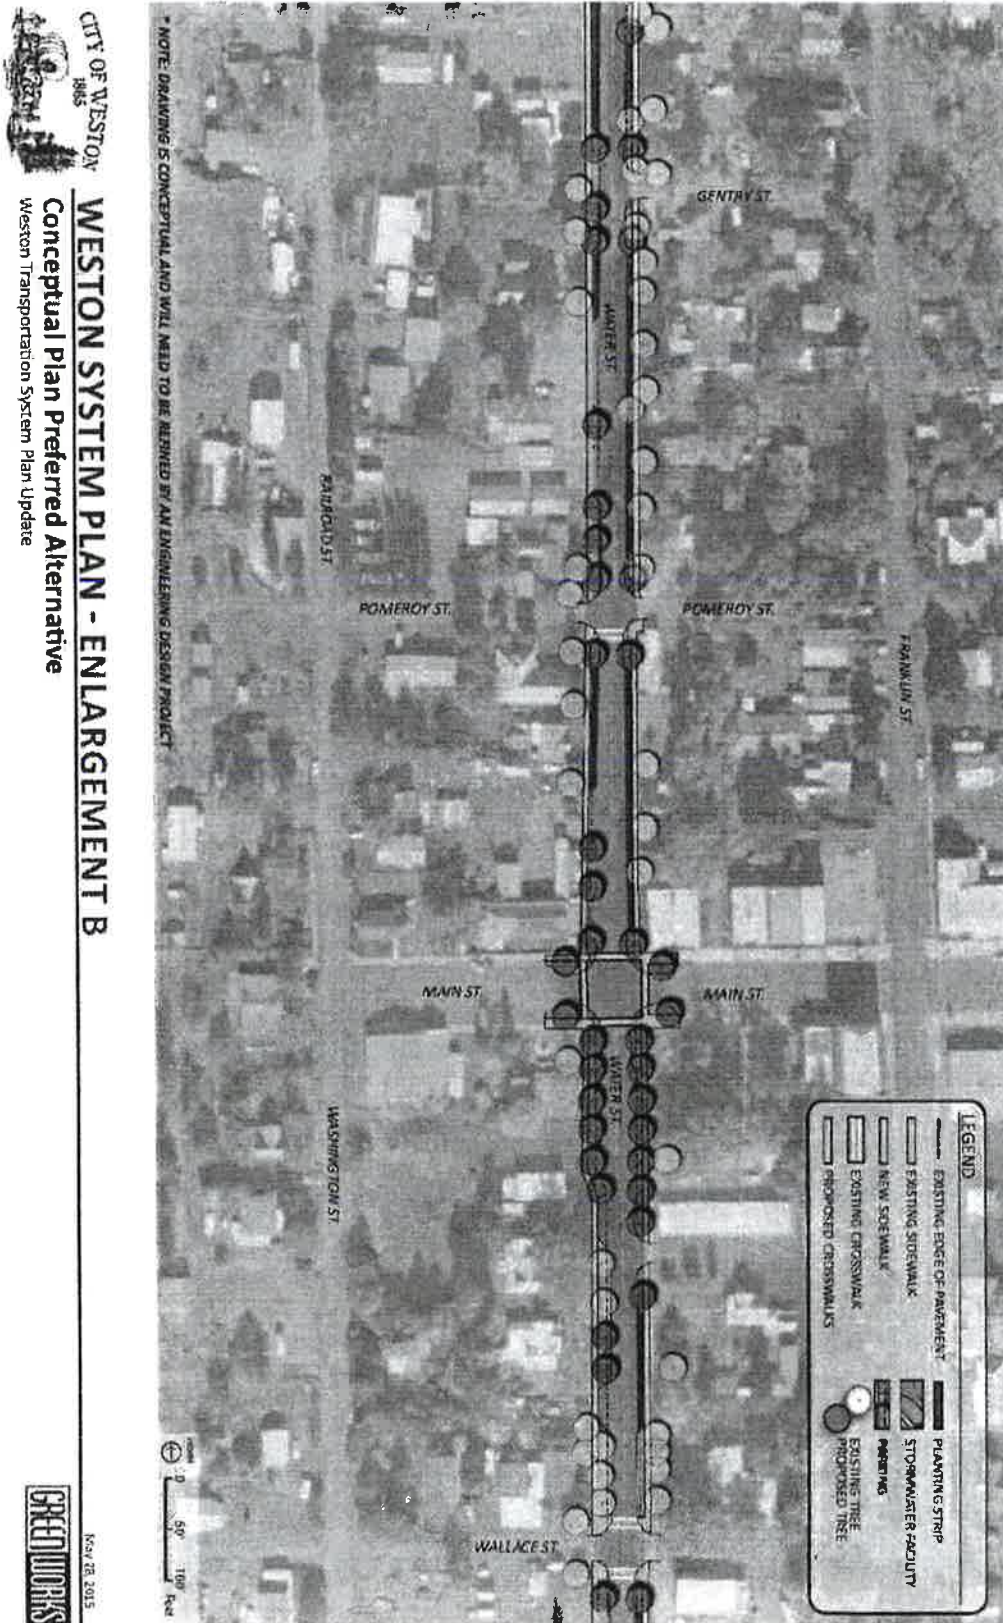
Project #1 - Water Street Improvements – Central Section
